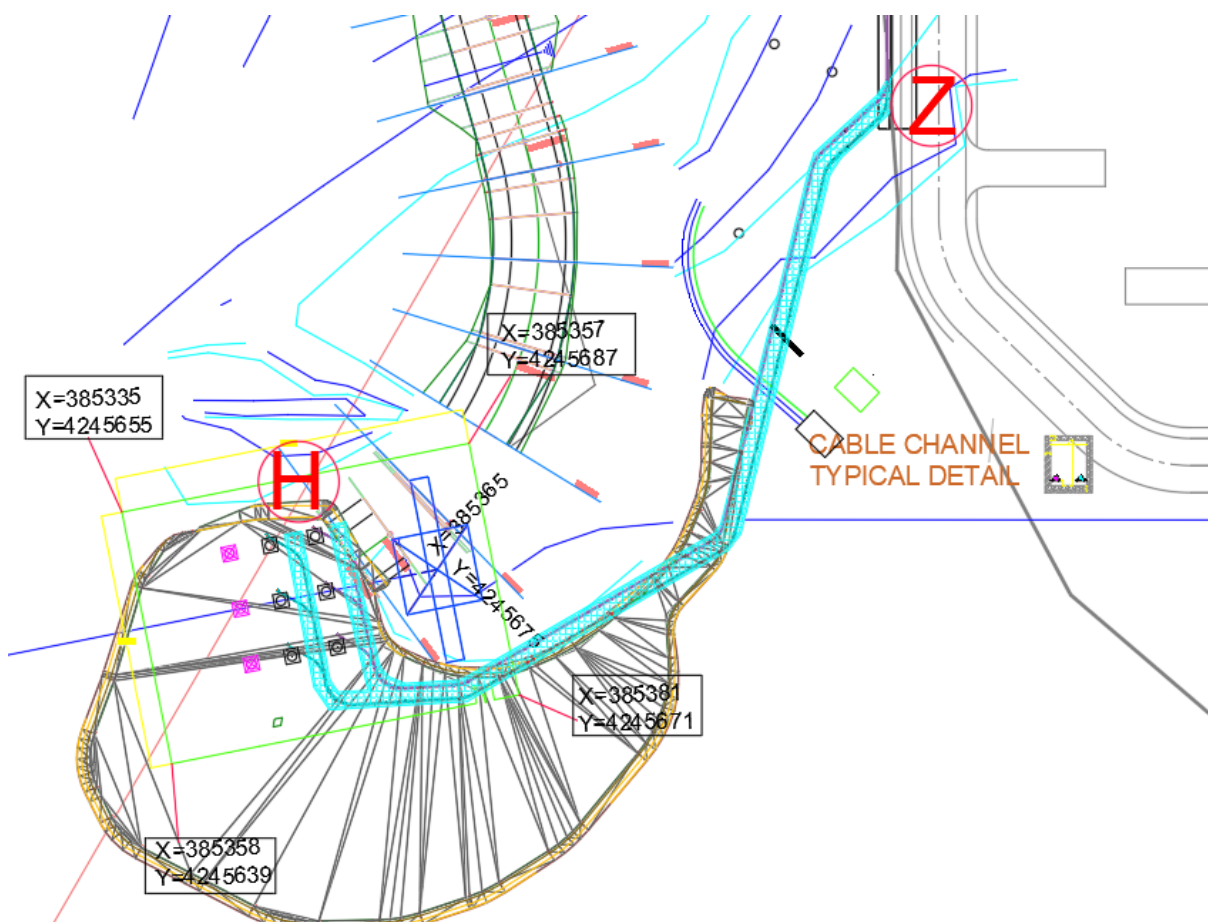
HV underground cable channel from the support wall to below the terminal pylon.
